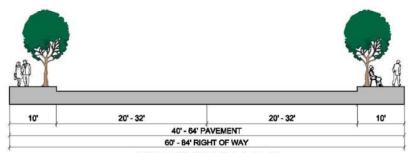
CITY OF MONROVIA GENERAL PLAN ROADWAY CROSS-SECTIONS
